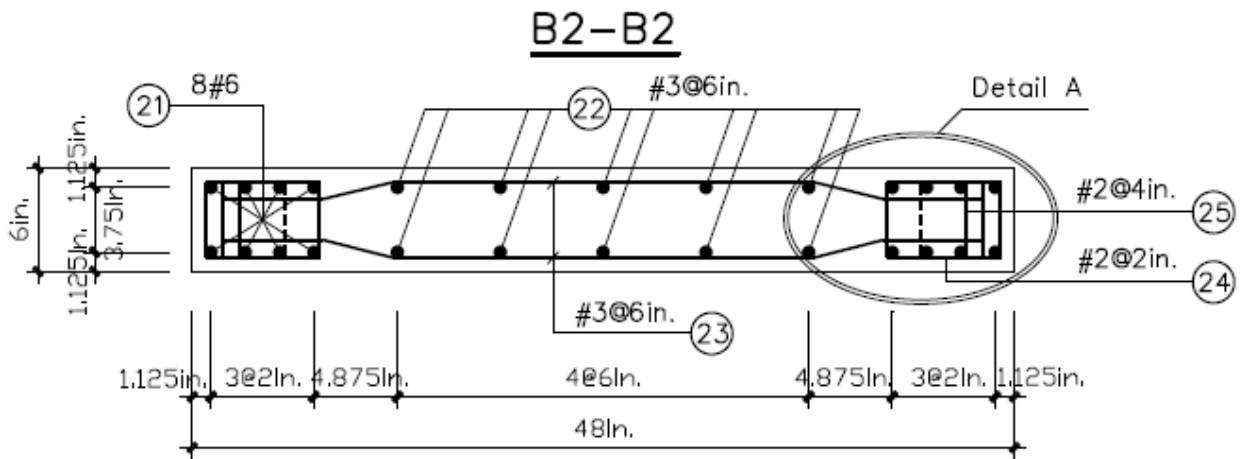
Specimen RW-A20-P10-S63 Base Section
